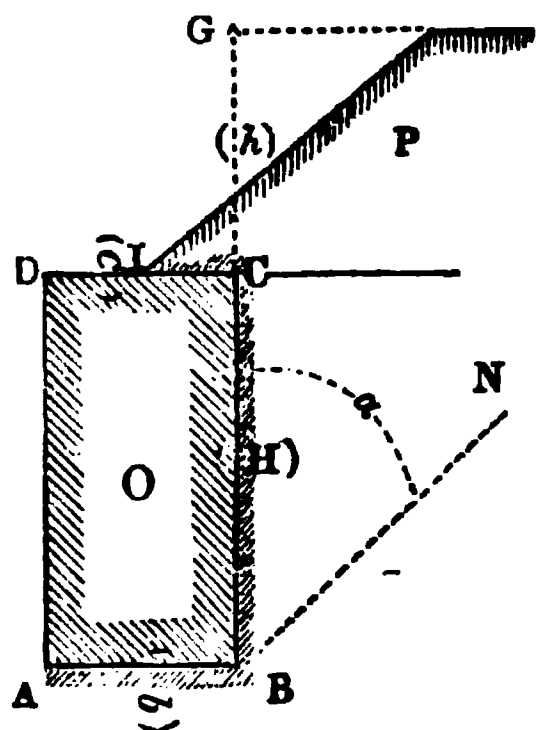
Represents a section O of a retaining wall with the face and back vertical.
